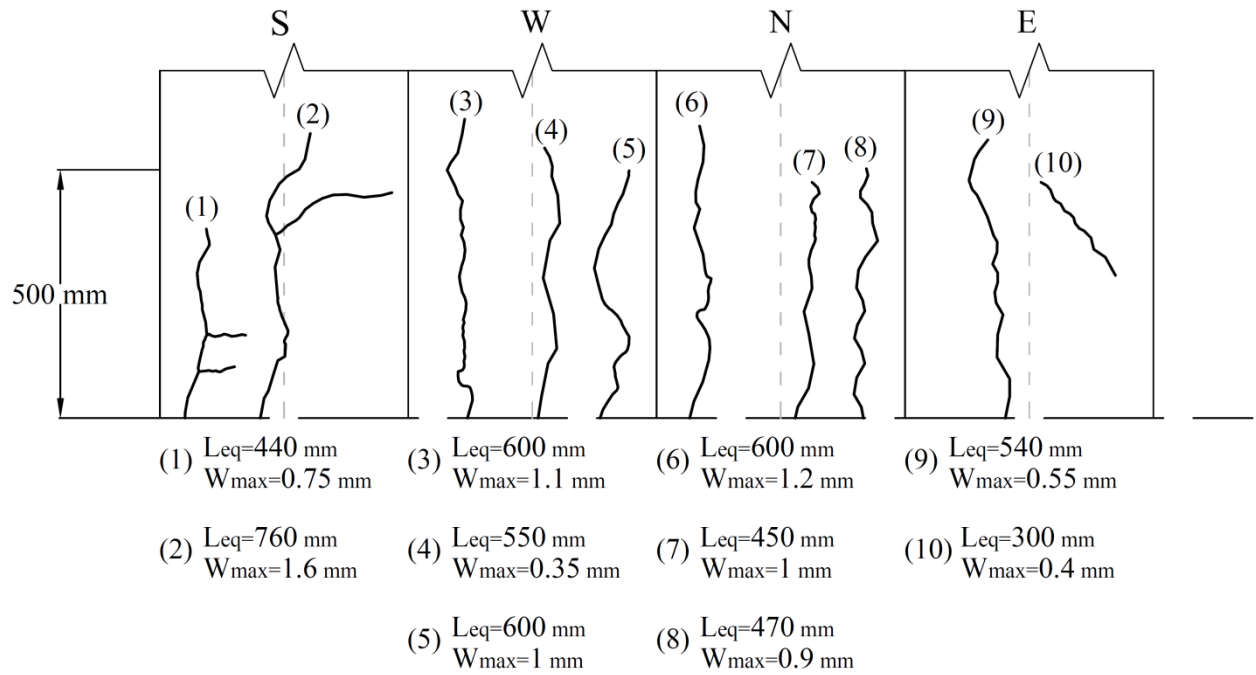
Details of corrosion-induced cracking for CL2 test unit on the four sides
